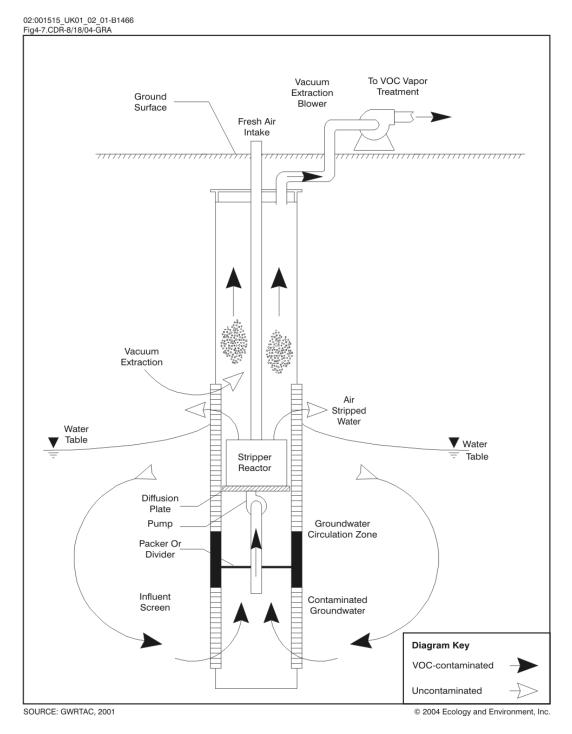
Typical Unterdruck-Verdampfer Brunner (UVB) Well Construction
